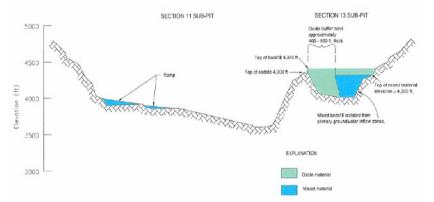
Cross-sectional schematic of Lone Tree pit and sub Section 13 backfill.
